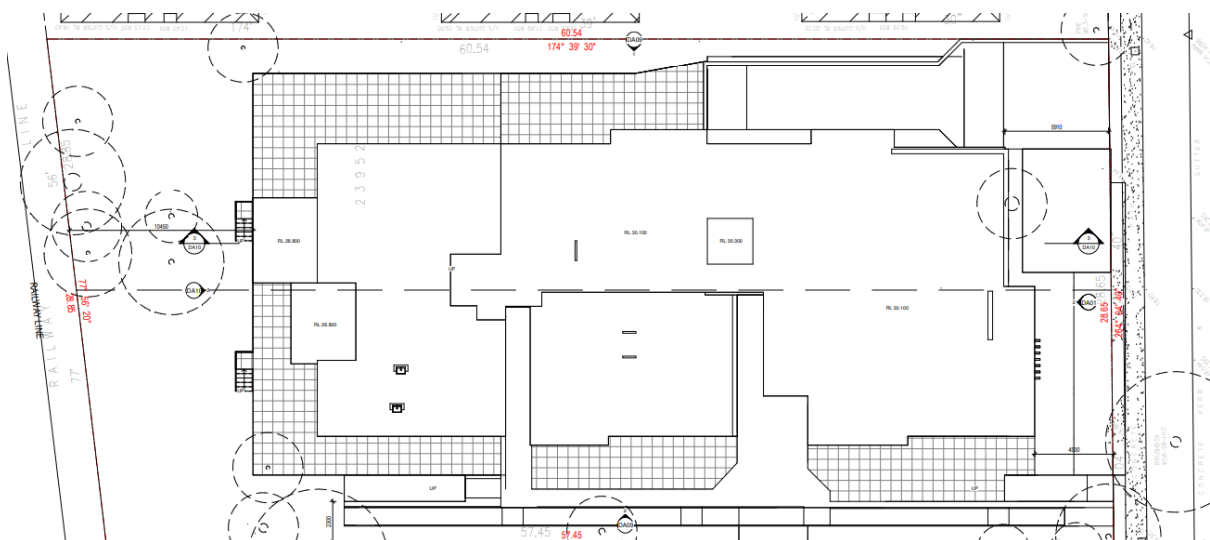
Extract of proposed roof plan (Source: Colin De Lore and Associates, 2023).
